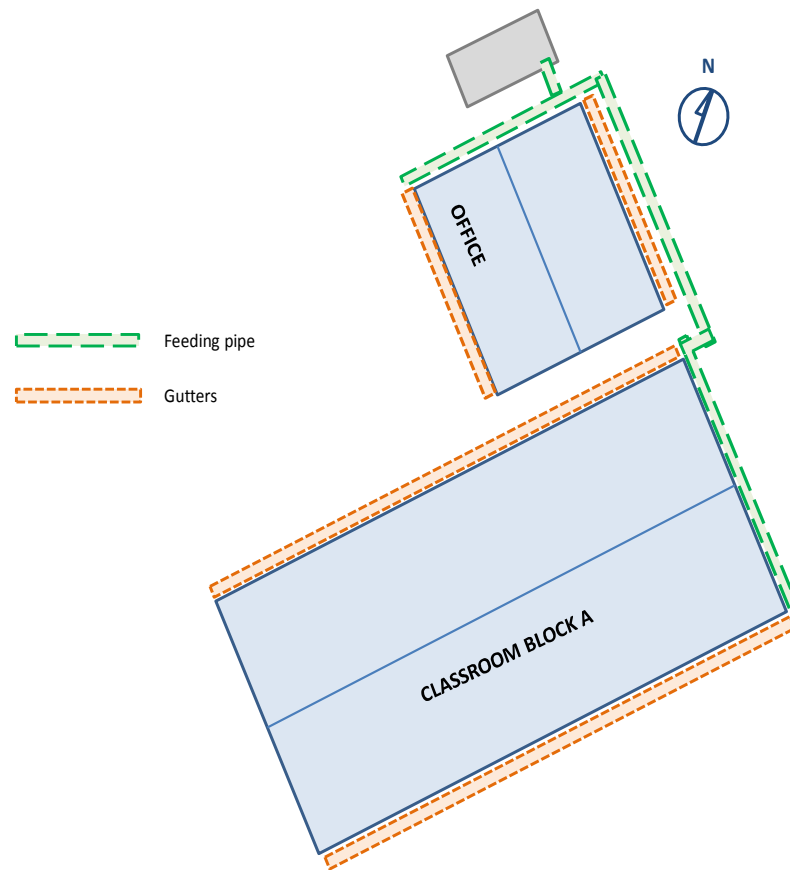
Water pool feeding system installation sketch. (Source: Own elaboration).
